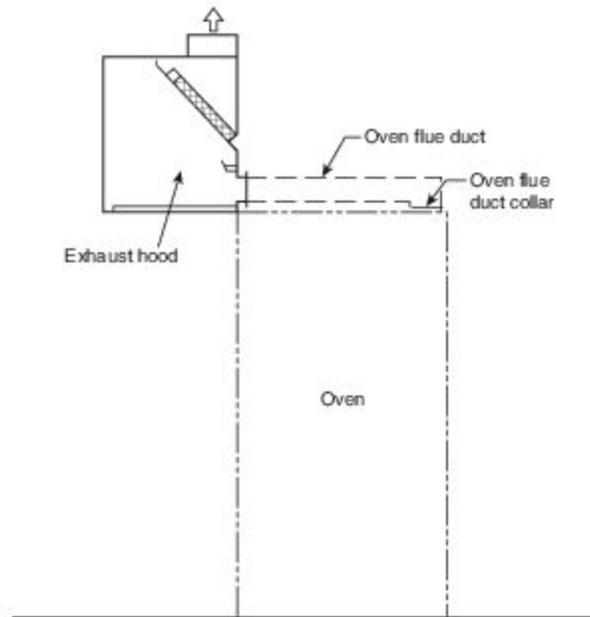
Typical Section of Eyebrow-Type Hood.
